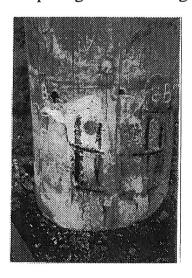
Corrosion cracking and spalling. Thoft-Christensen, 2000.
